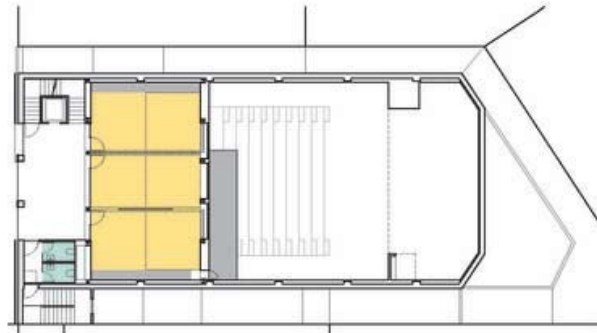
Floorplans of Can Clariana (source: Archdaily)
